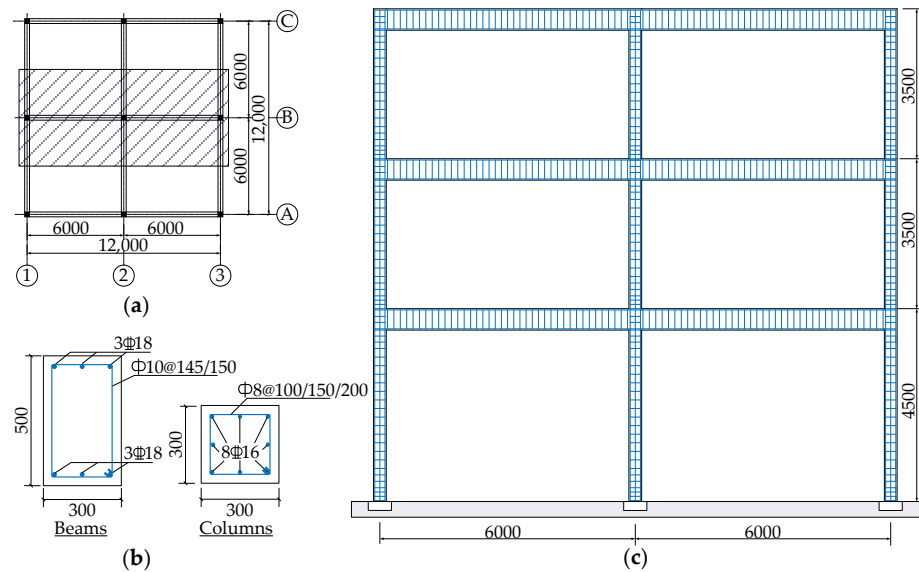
Geometries and reinforcement details for RC frame (all dimensions in mm): (a) plan view; (b) reinforcement details of the beam and column section; (c) elevation view.
